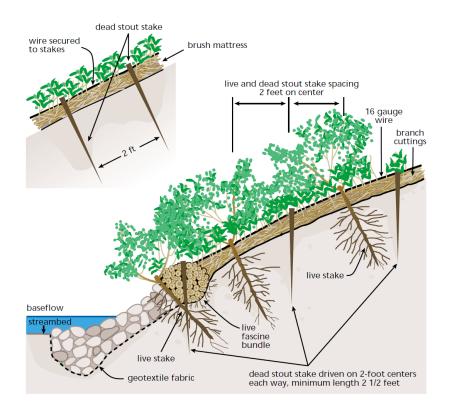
Cross section of an embankment showing multiple stabilization techniques including toe slope rip rap, geotextile fabric, live fascines, live stakes, and brush mattress consisting of a layer of branch cuttings providing soil cover and pinned with stakes. USDA NRCS 2001.
